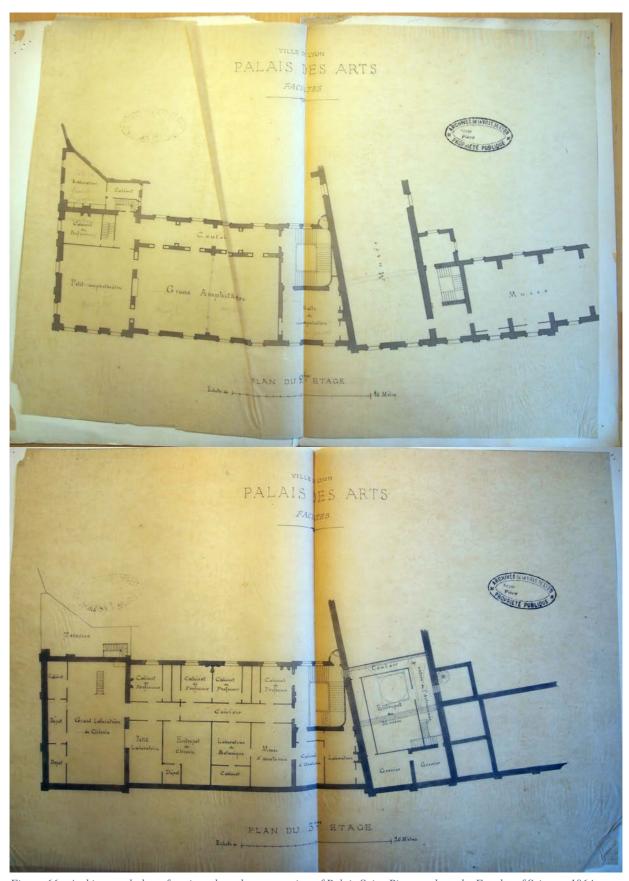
Architectural plan of projected southern extension of Palais Saint-Pierre to host the Faculty of Science, 1864. AML
